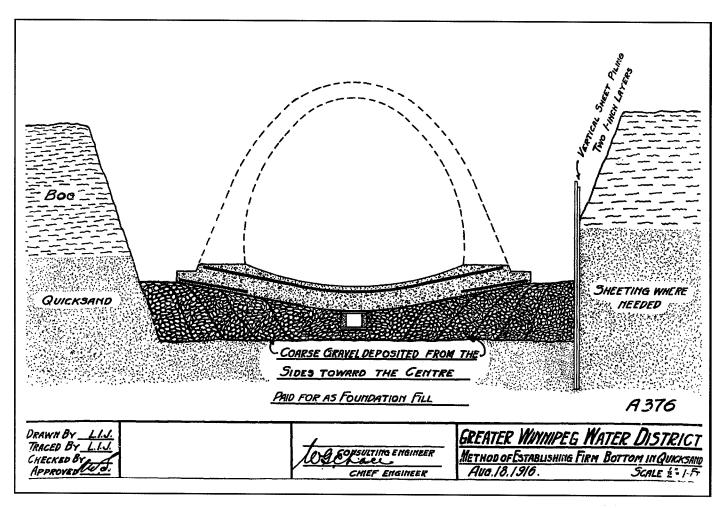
Method used to establish a 'firm' foundation when groundwater piping conditions were encountered. (from GWWD Drawing A-376)
